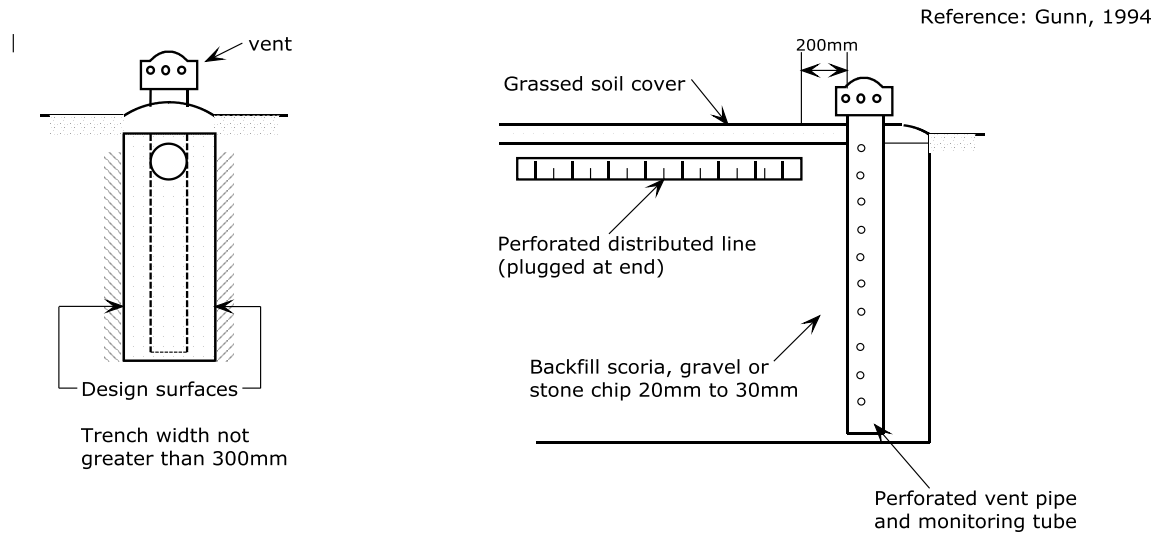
Section of Shallow Narrow Trench (NTS)
